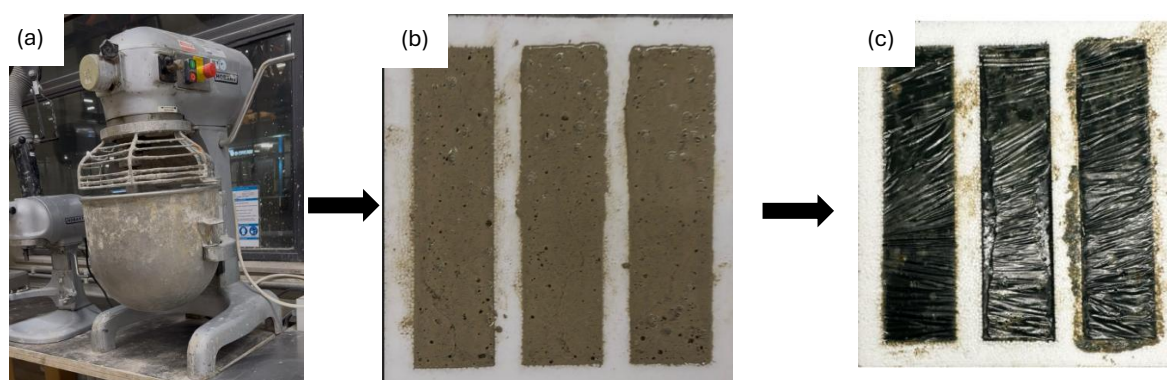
(a) Casting of AAS mortar, (b) placement into moulds, and (c) appearance of the specimen one day after casting.
